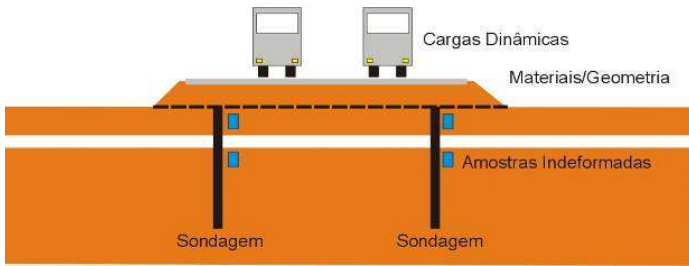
RECOMMENDED GEOTECHNICAL INVESTIGATION IN NEW EMBANKMENTS.
